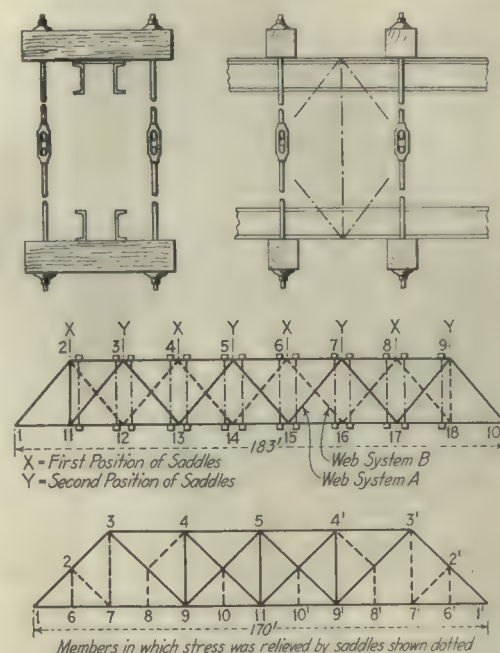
DOUBLE INTERSECTION WARREN TRUSS, WITH DETAILS OF SADDLE
